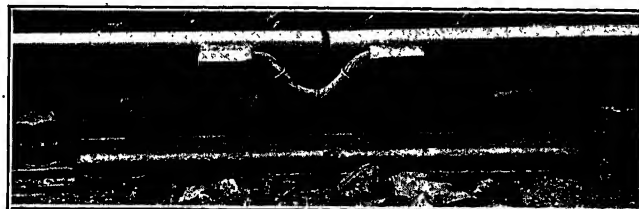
WELDED BOND (EMBRU) CROSS-SECTION 95 Sq. Mm.
